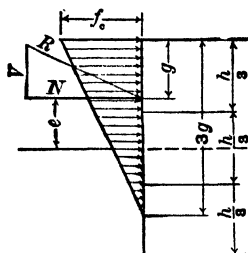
Stresses Caused by a Force Acting Outside the Middle Third of Plain Concrete Section. (See p. 380.)
